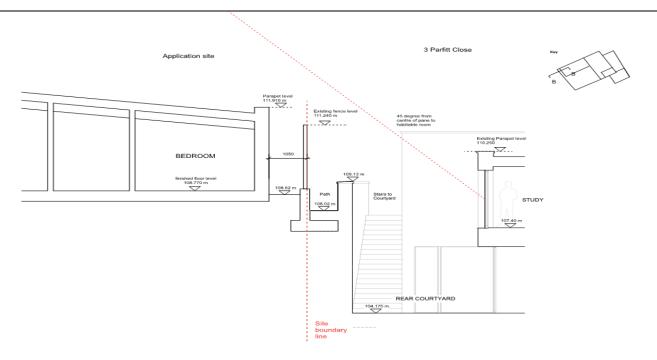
Section of proposed dwelling with 3 Parfitt Close to the rear
